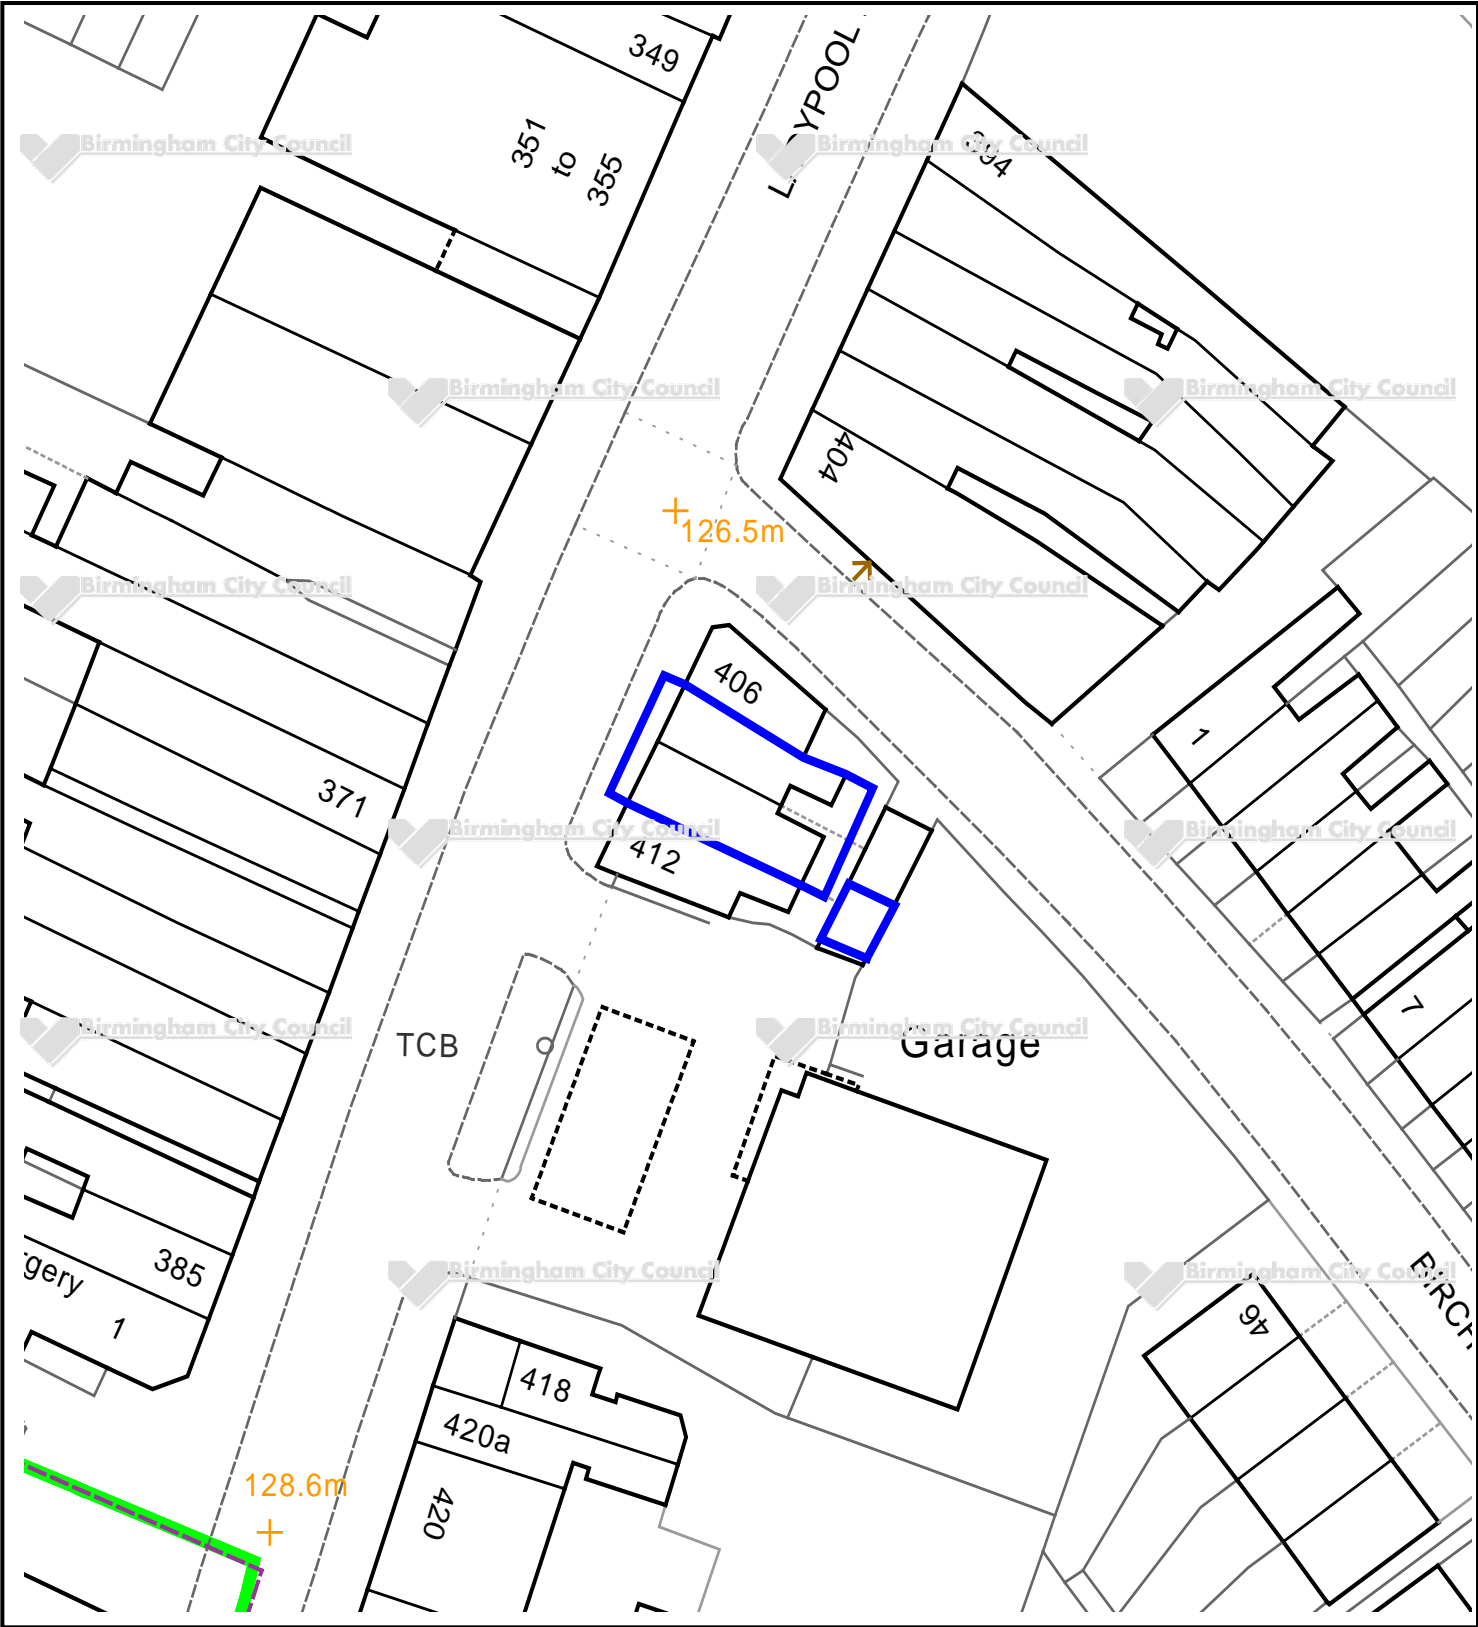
Single-storey rear extension at no. 408 Ladypool Road
